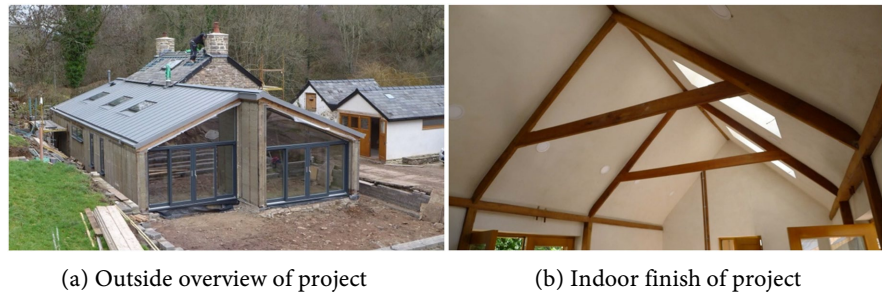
Hempcrete building project from UK hempcrete (<https://www.ukhempcrete.com>; Used with permission).
